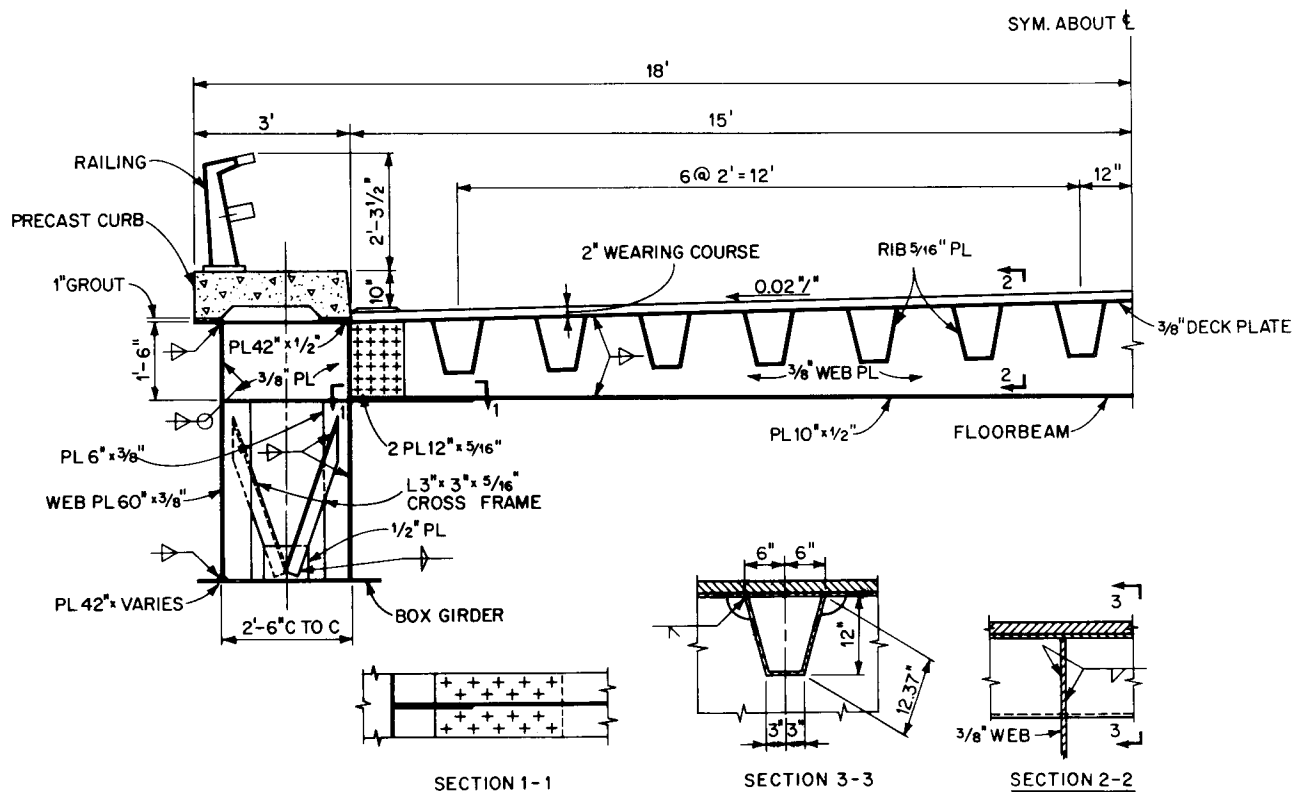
Half cross section of orthotropic-plate bridge with 120-ft span.
